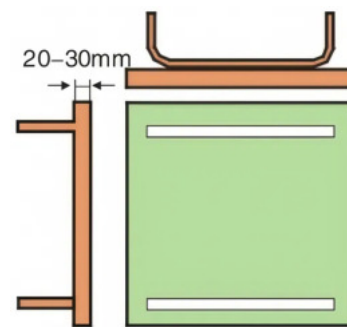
Schematic Diagram of Support Steel Plate for Cast-in-Place Girders
